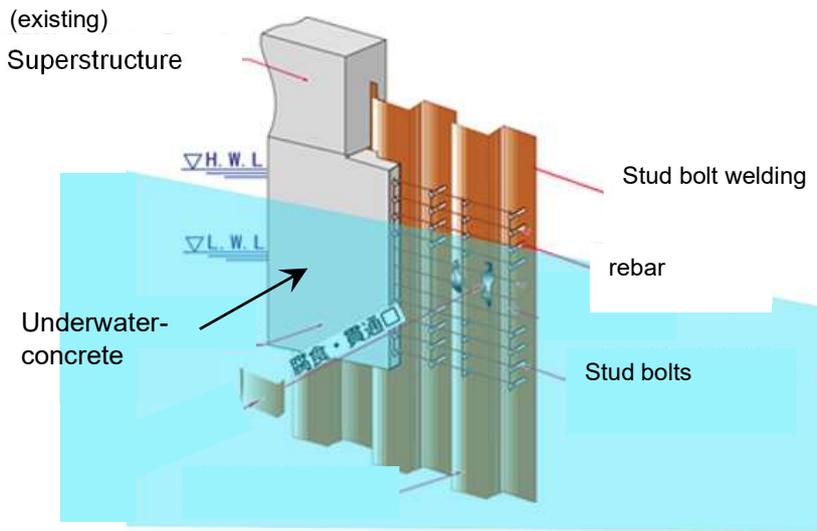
Example of repair and reinforcement of steel sheet piles by thickening with reinforced concrete
